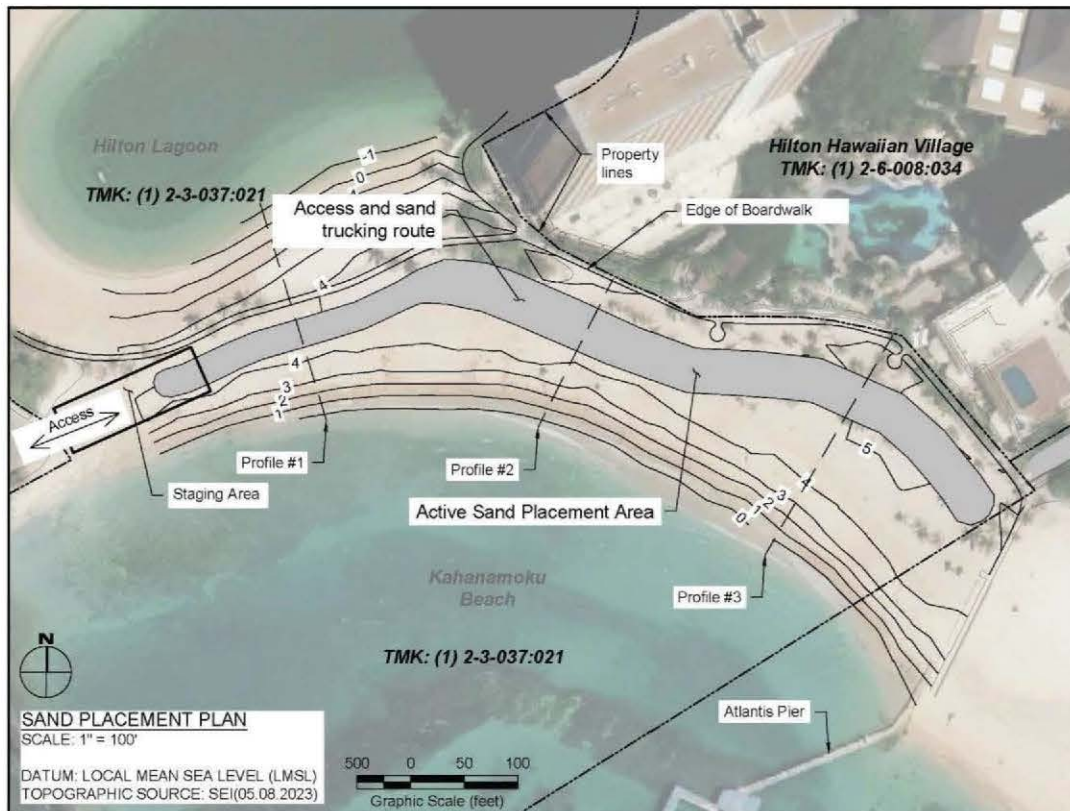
Proposed sand placement plan on beach. The project involves placing sand on the beach along the seaward side of the boardwalk. The sand will be placed about 2 feet higher than existing ground and 25 to 40 feet wide. Construction equipment will access the project site from the parking lot in the middle left of the photograph. All work will be performed on parcel (1) 2-3-037:021.
